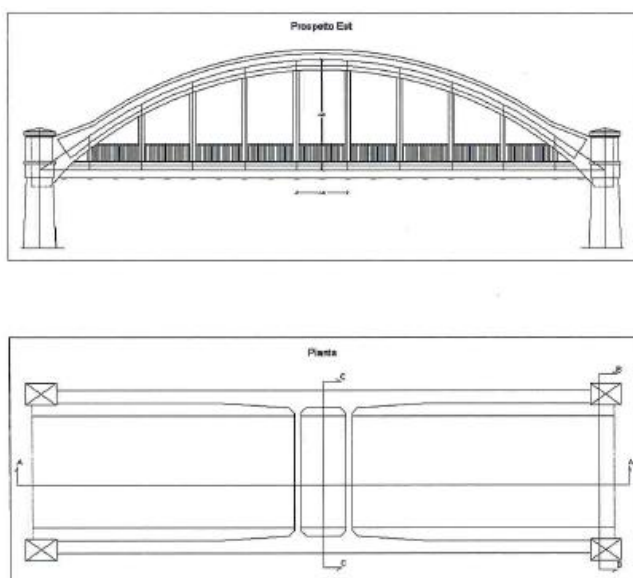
Elevation and plan of the building / Prospetto e pianta del manufatto
